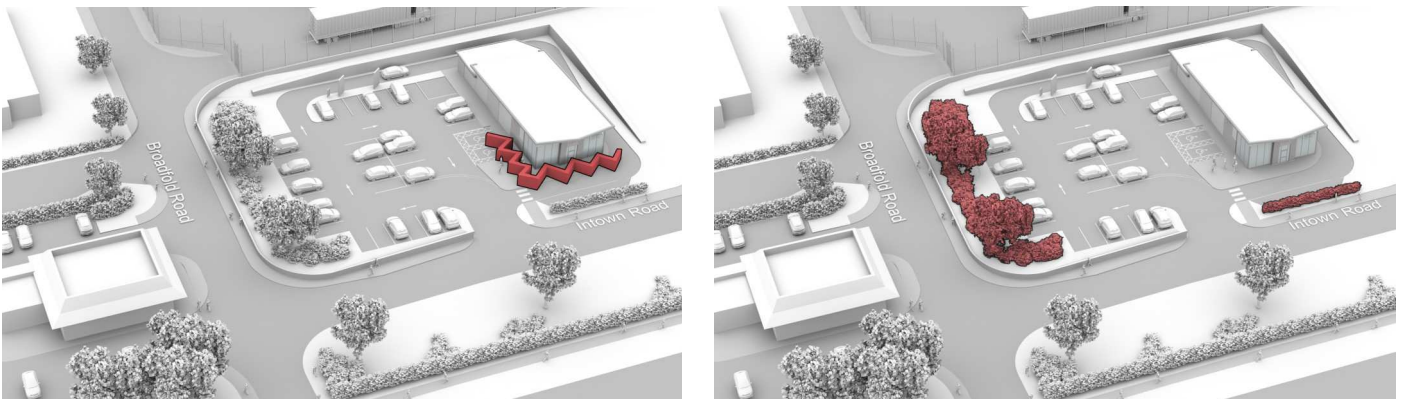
The location and orientation of the proposed building has been determined by the visibility of the site, and the desire to provide an 'active frontage' to Broadfold Road, Intown Road and the A90 beyond. The building will contain a seated restaurant, and as such will provide an opportunity for glazing to be incorporated within the elevations. The glazing will therefore be formed on the eastern/southern elevations providing visual interest and activity to the building's most prominent corner. The site currently benefits from mature landscaping along the edge of the A90, softening the views into the site while providing a better view out of the proposed restaurant. There is also existing landscaping along the southern boundary of the application site, which will be retained/strengthened, while the eastern boundary will receive low level planting.
